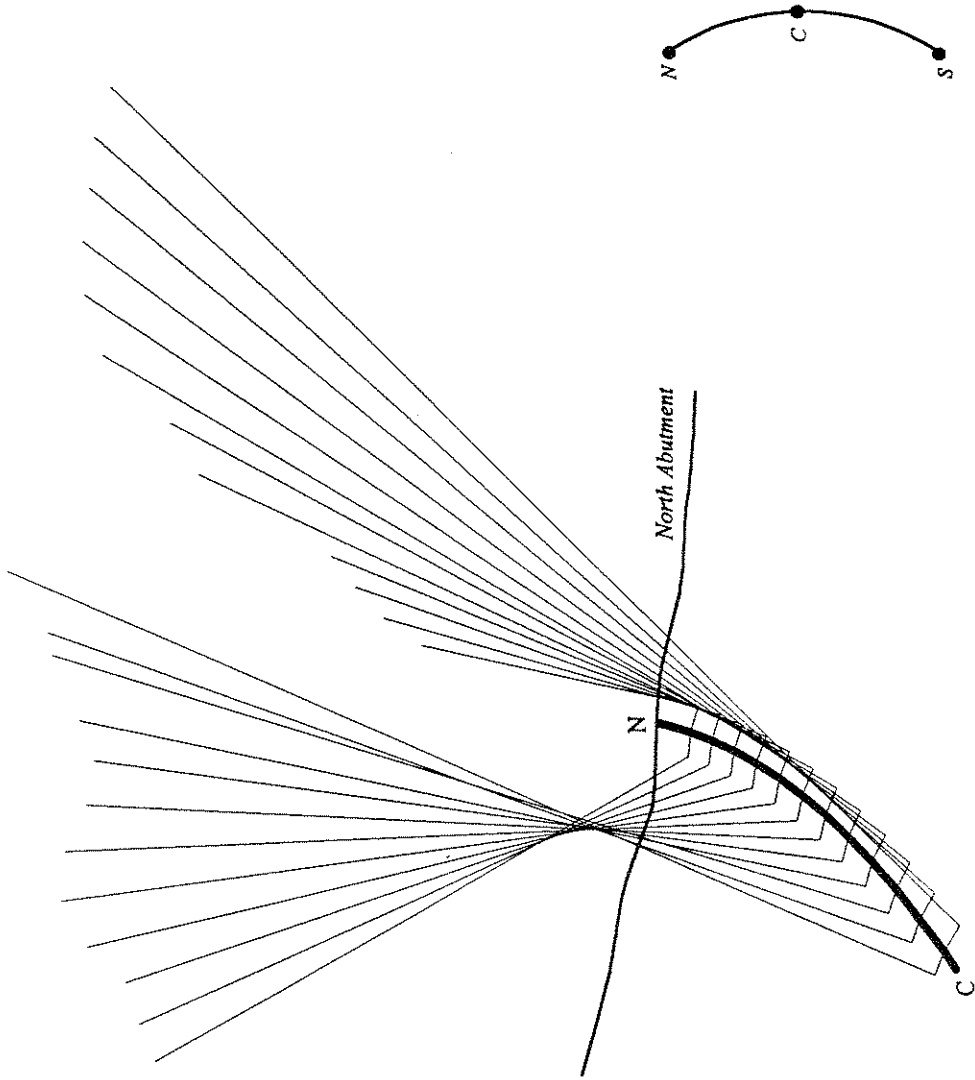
RUCK-A-CHUCKY STEEL BRIDGE; 3D MODEL OF HALF SPAN.
